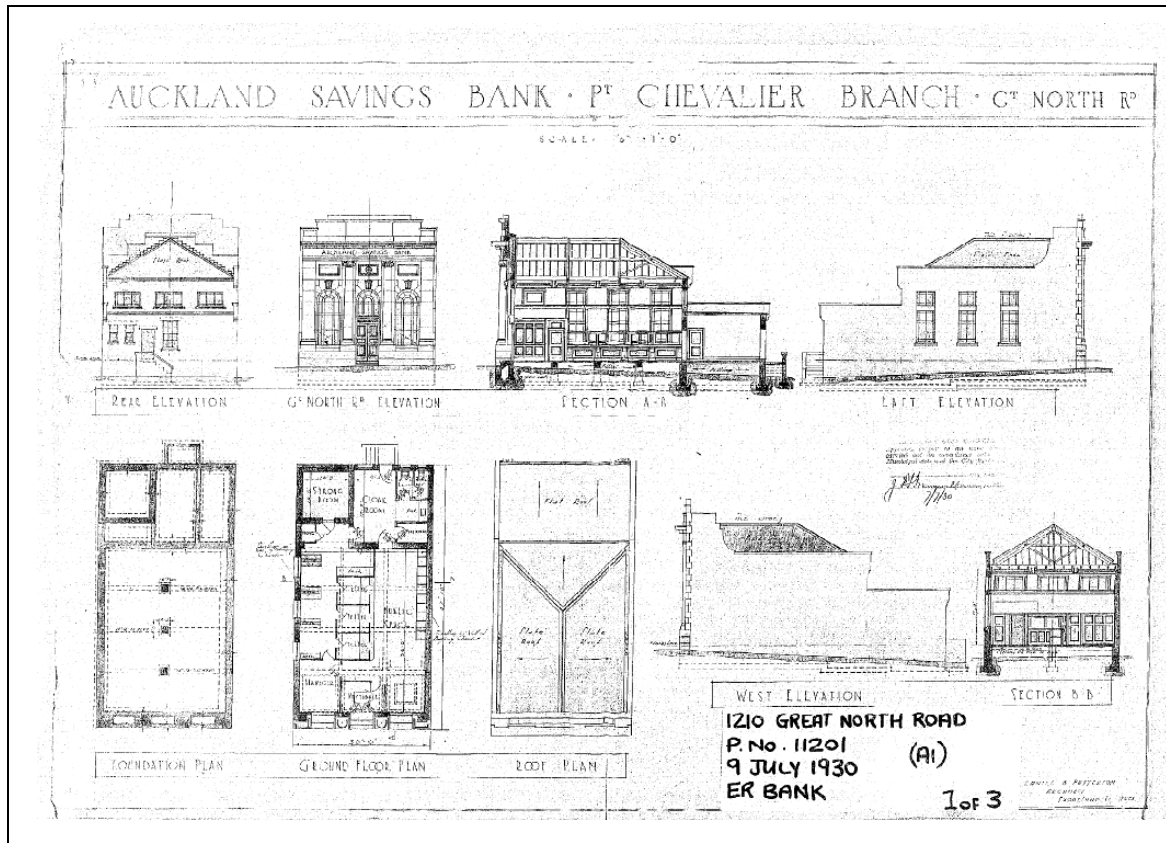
Auckland Savings Bank Point Chevalier Branch Plans and elevations. Auckland Council Archives. Permit No. 11201
